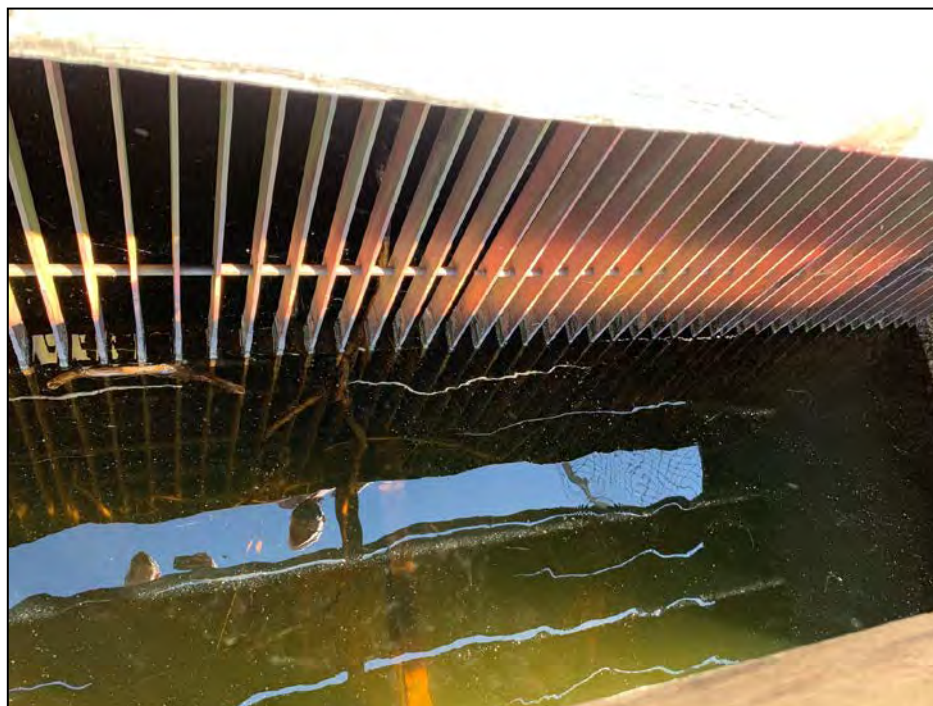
Trash racks at the inlet end of the low-level outlet system.
